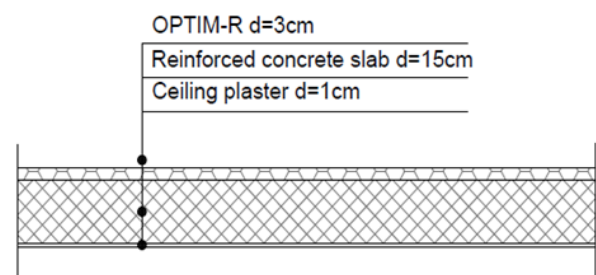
Cross-section of the slab above the second floor with the new insulation material
